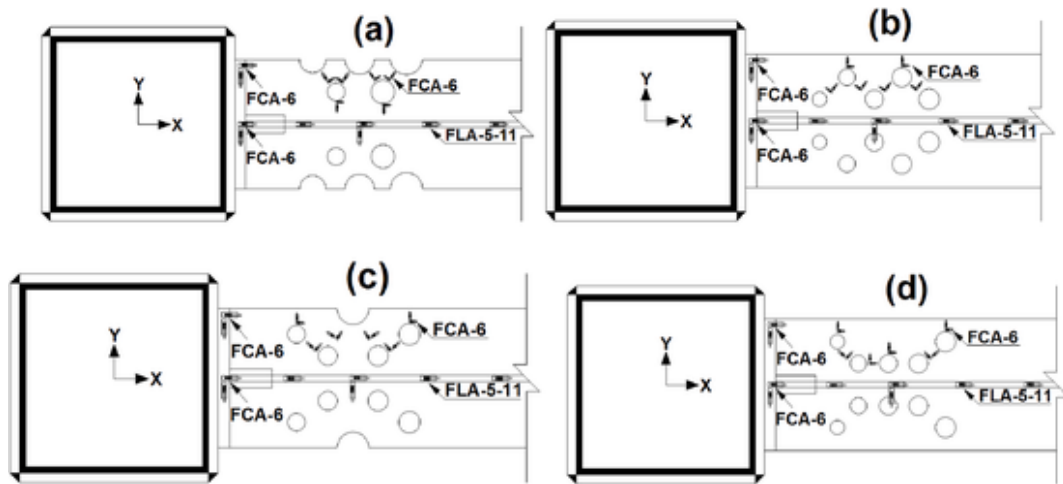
The arrangement of FLA-5-11 and FCA-6 strain gauges on beam-to-column connection groove weld and beam flange of a) DFC1, b) DFC2, c) DFC3, and d) DFC4.
